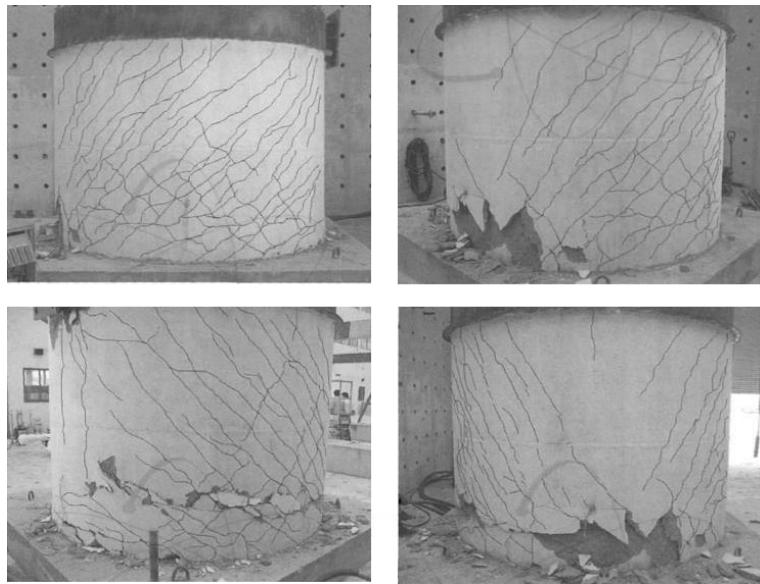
Failure mode of cylindrical wall (Cho et al (2007))
